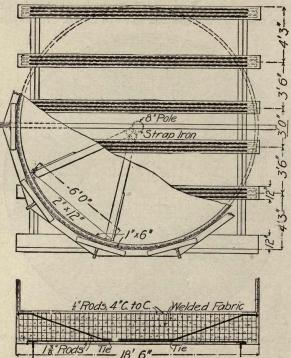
Falsework and Girders, Tank for American Steel & Wire Company.
